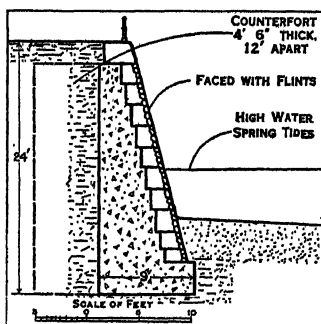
SEA WALL AT HOVE, SUSSEX
